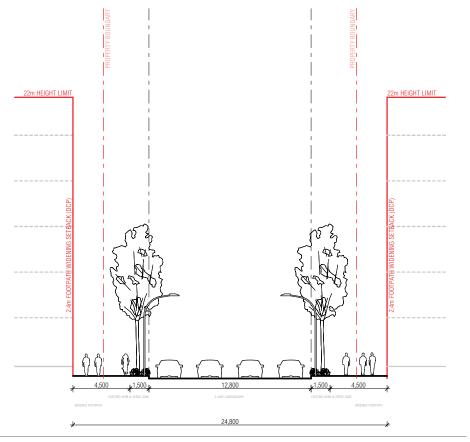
Indicative street section – O'Riordan Street (A), North Alexandria
